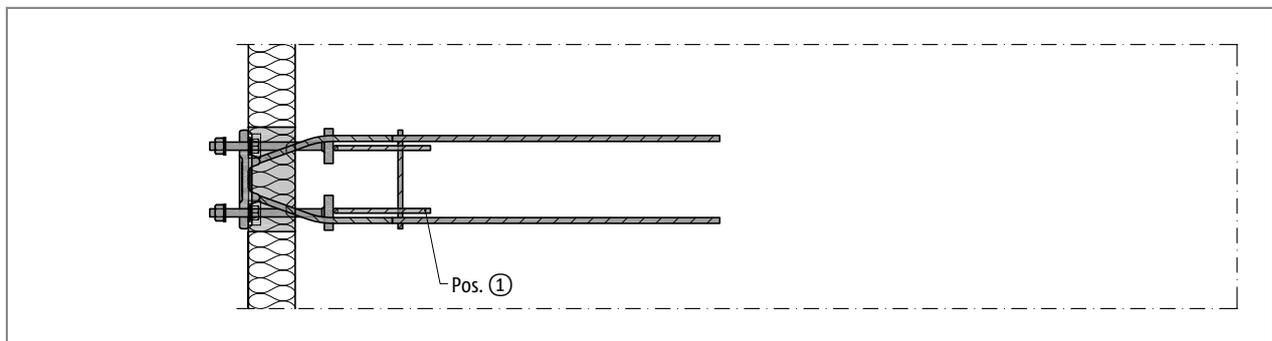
Schöck Isokorb® T type SQ: On-site reinforcement: Plan view
